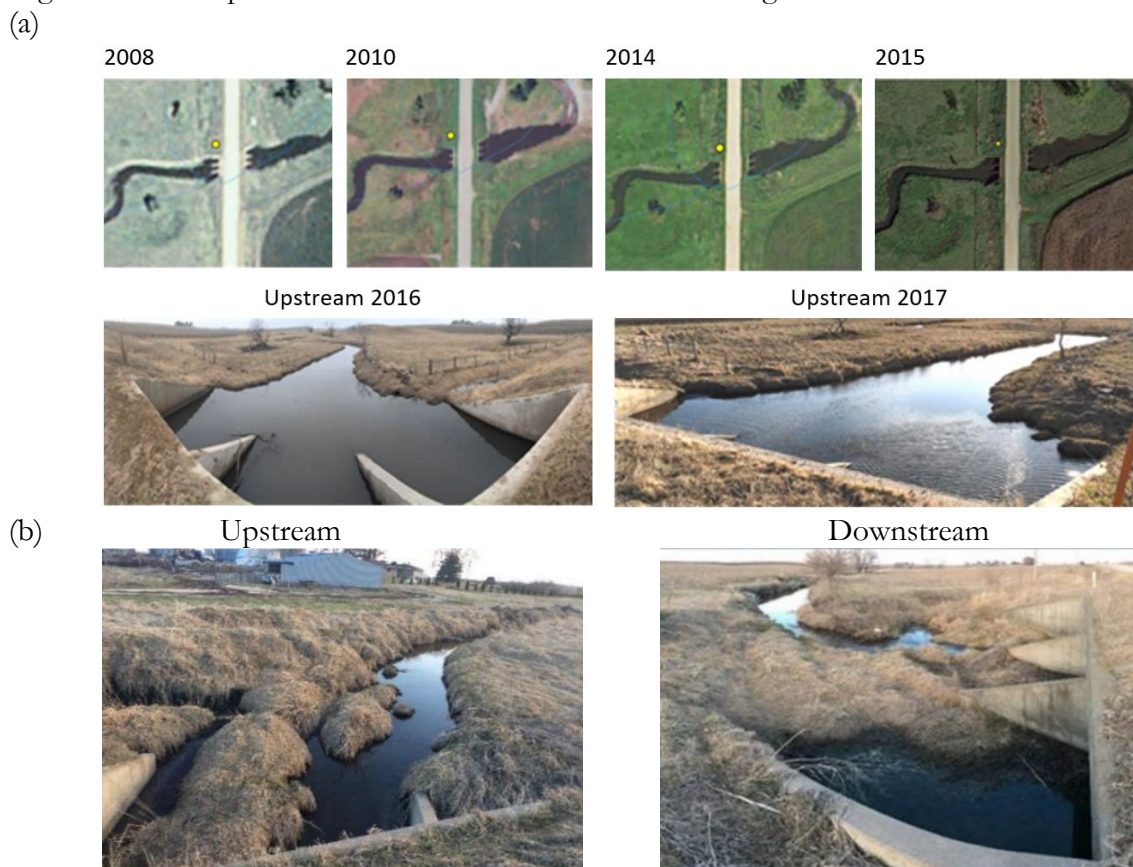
Samples of multi-box culverts in US Midwest: a) culverts without sediment accumulations (less than 5% of the culverts in Iowa); b) silted culvert (about 95% of Iowa culverts)
